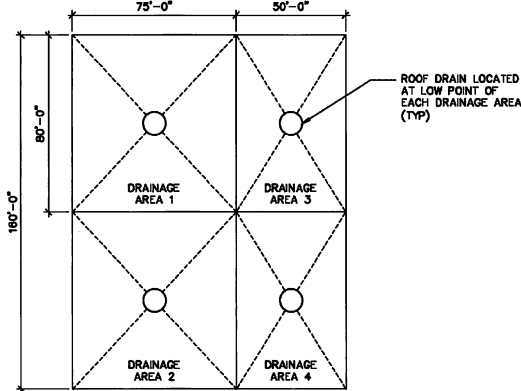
G.5. Plan View of Multi-Directionally Sloped Blue Roof
